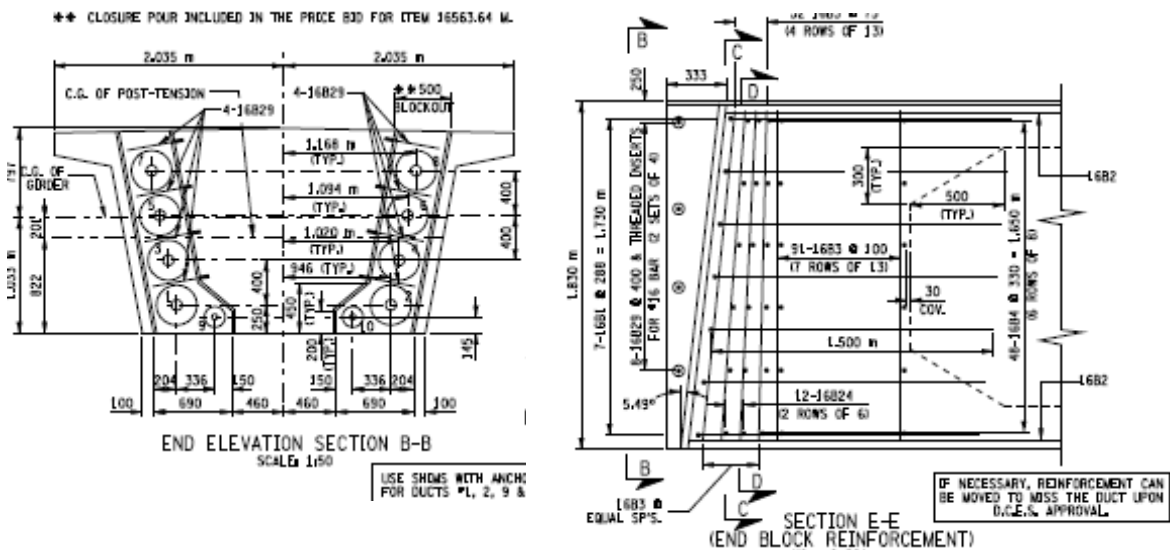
Post-tension anchors in the end and details of anchorage zone reinforcement.
